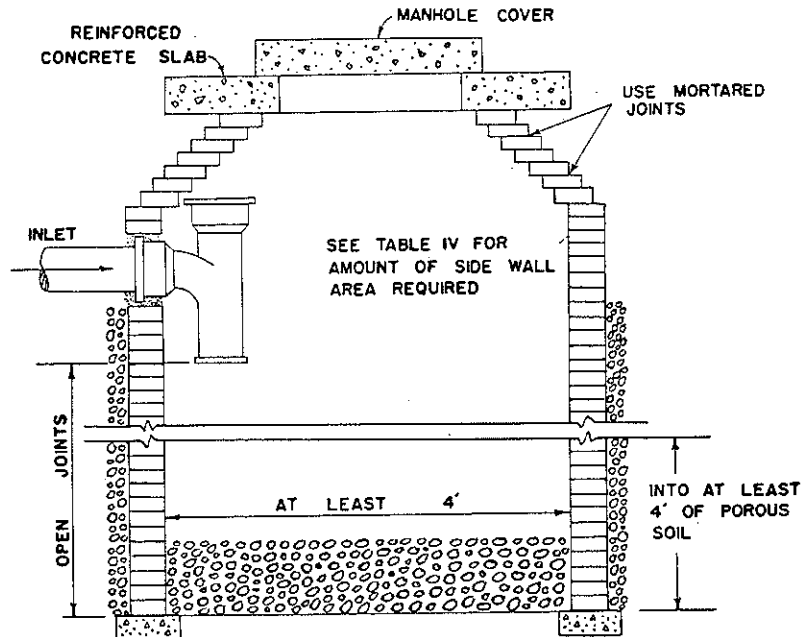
Details of Seepage Pit. Connect septic tank to pit with a tight jointed sewer.
